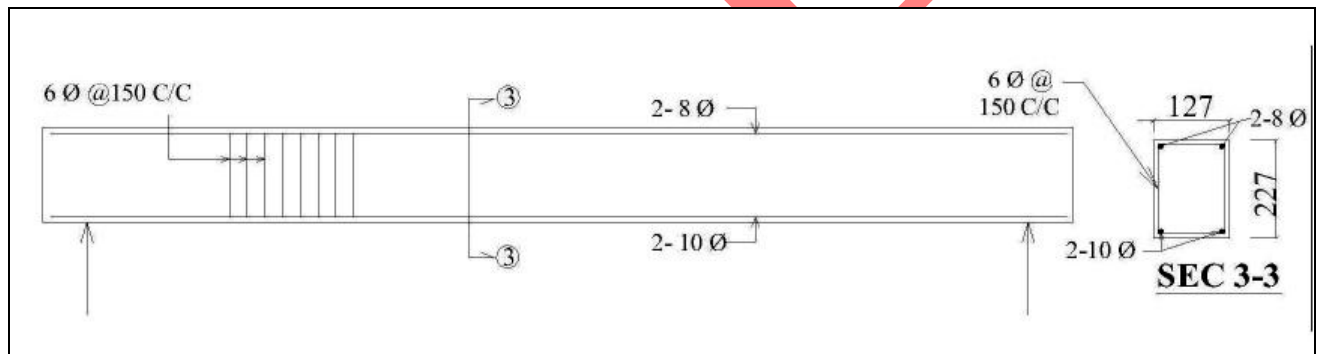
Longitudinal and Cross-Section of Unretrofitted Under Reinforced Beams (All Dimensions are in mm)
